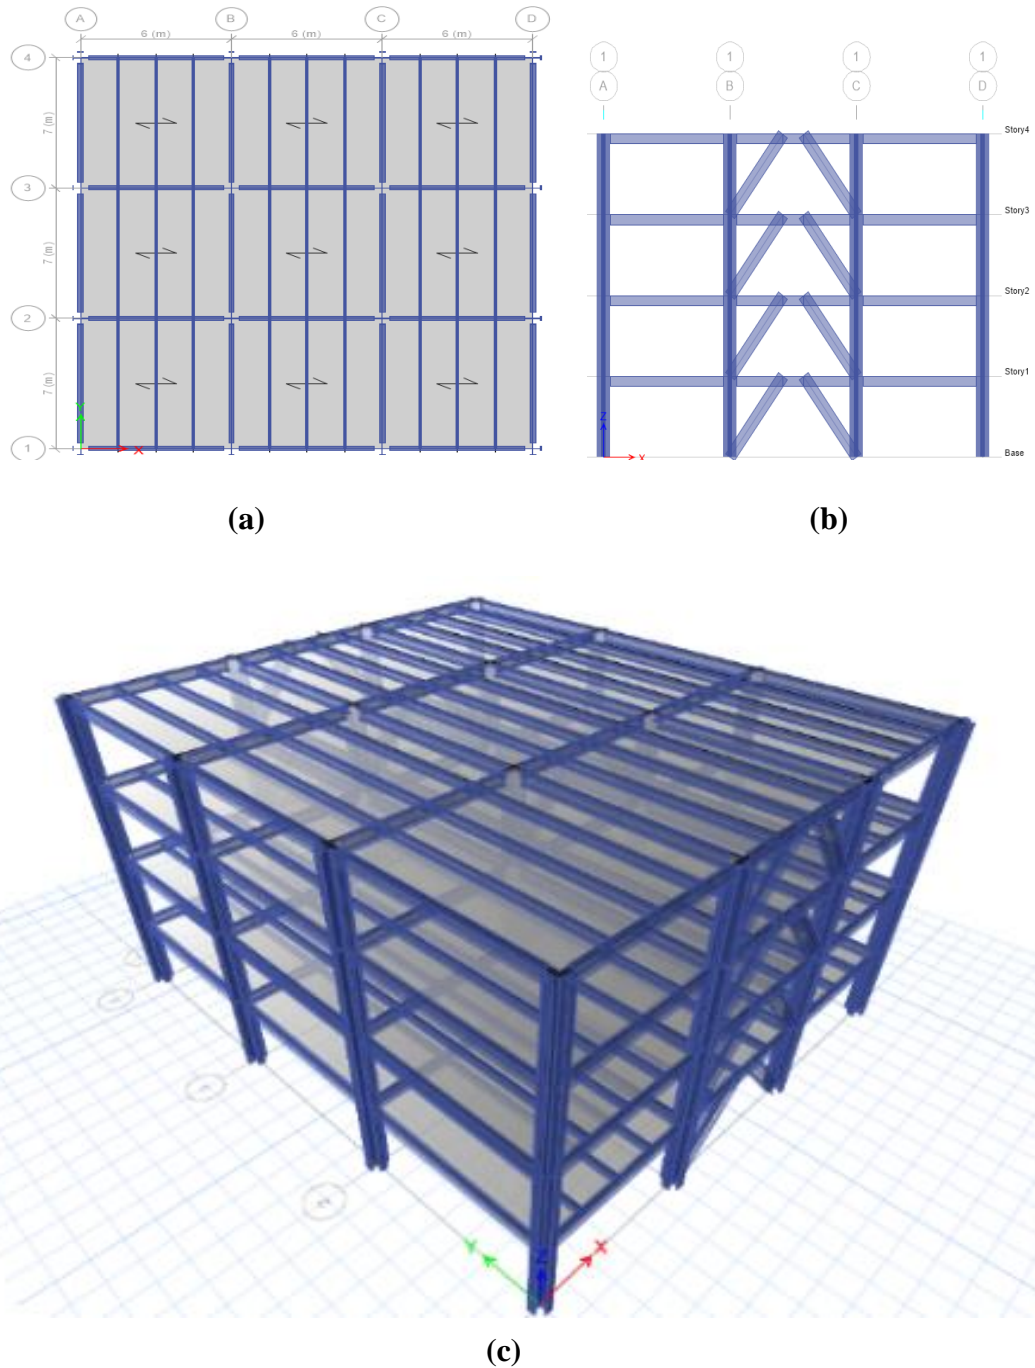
(a) Structure Plan (EBFs), (b) Structure Elevation (EBFs) and (c) 3D Rendered Model (EBFs)
